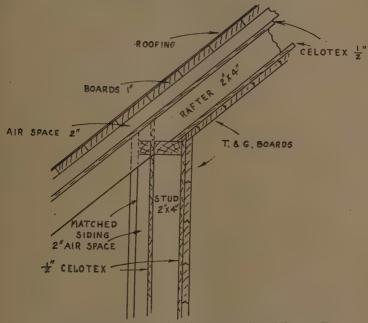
Detail of wall and ceiling construction of Storage F.
